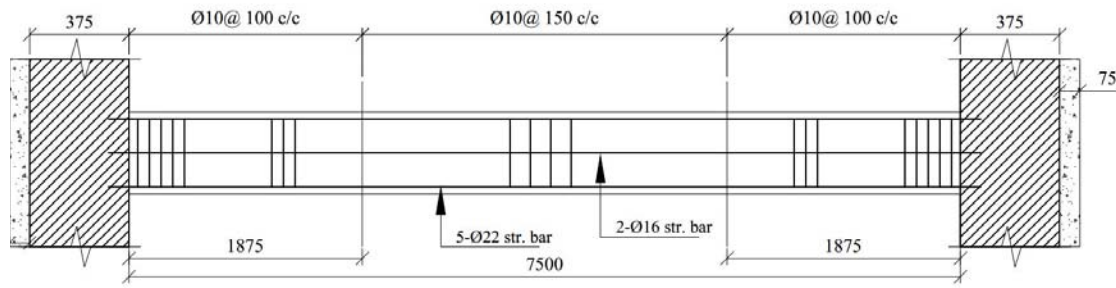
Longitudinal section of retrofitted beam of 1st floor
